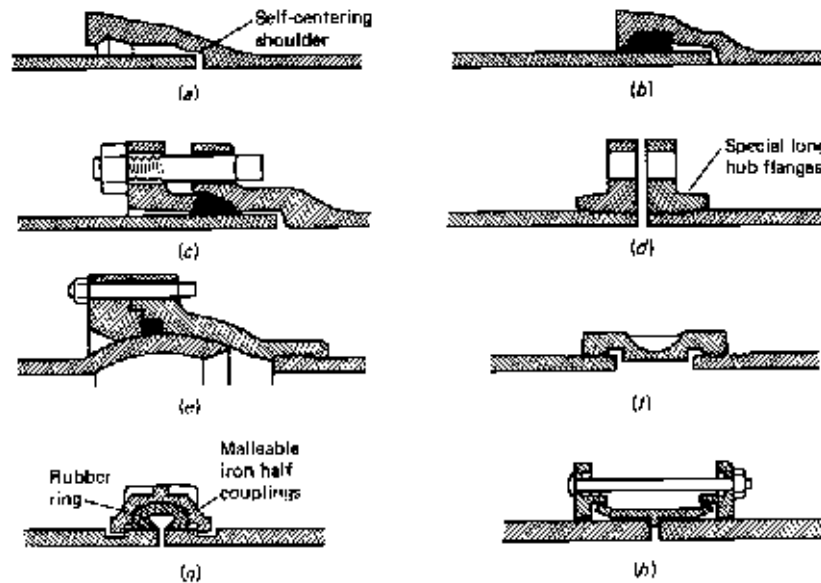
Cast-iron pipe joints (a) Bell-and-spigot (b) push-on (c) mechanical (d) flanged (e) ball (f) threaded (g) victualic coupling (h) dresser coupling
